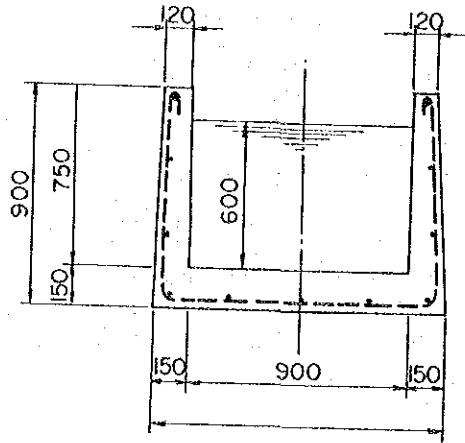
Plan of Tunneling for Emergency Drainage and Tributary Underdrain
